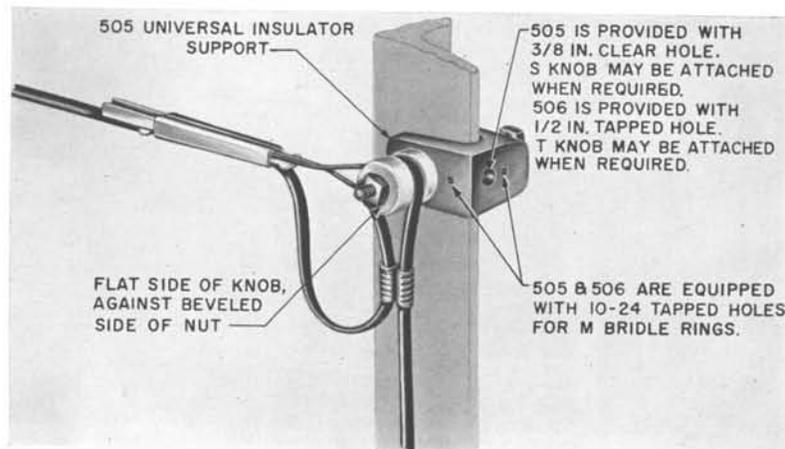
FIRST ATTACHMENT—NO. 505 OR 506 UNIVERSAL INSULATOR SUPPORT
